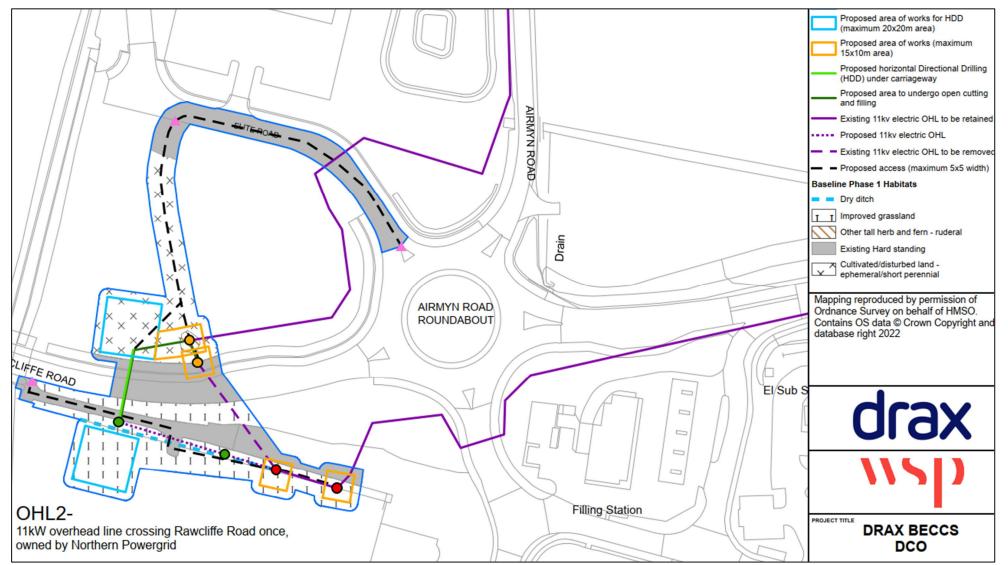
Plan showing Proposed Areas of Works for HDD (OHL2)
